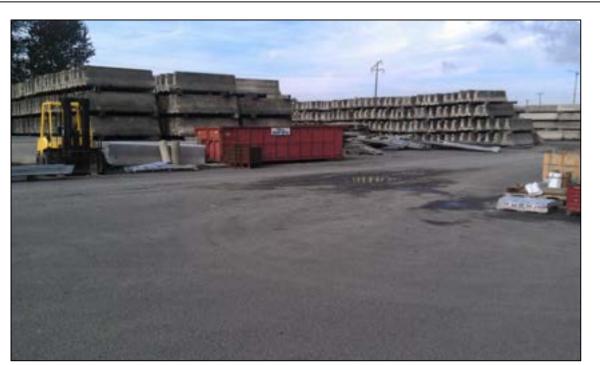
Guardrail post storage in southwest lay-down material storage yard.
